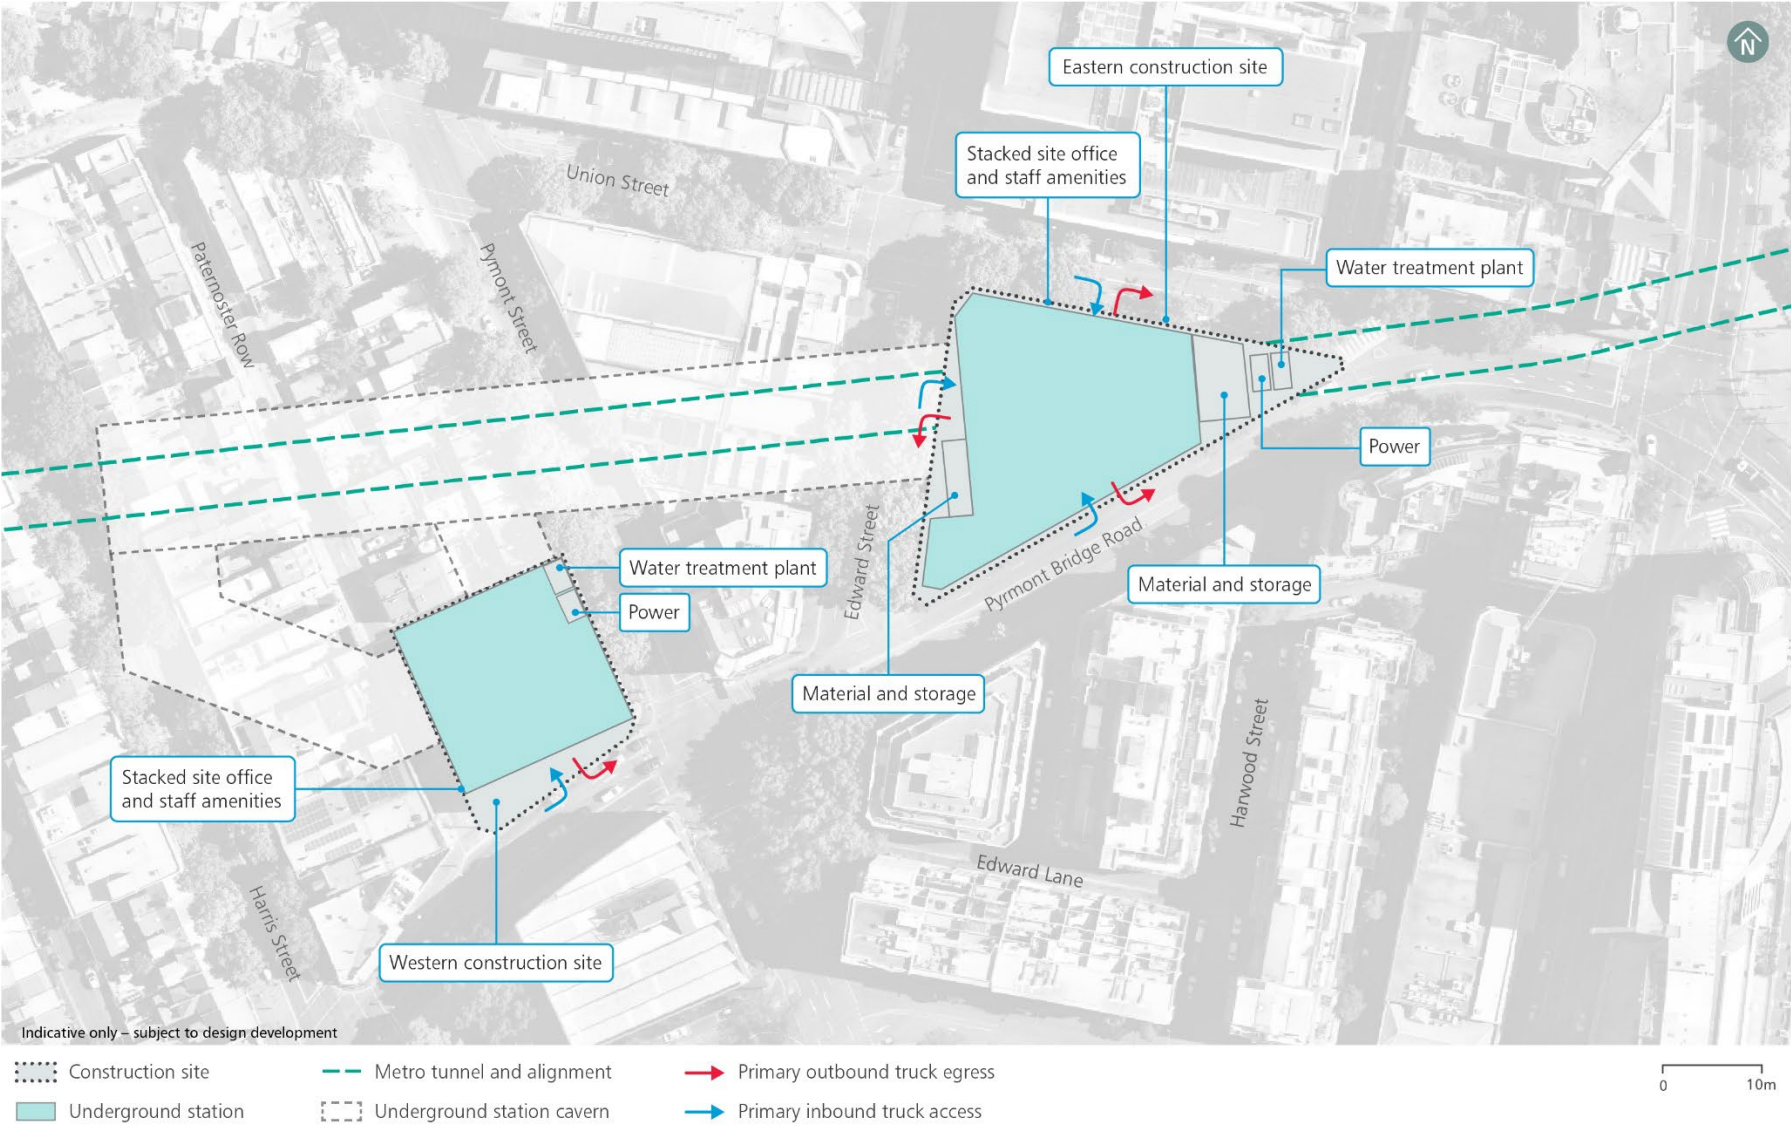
Indicative construction sites layout – Pyrmont Station
